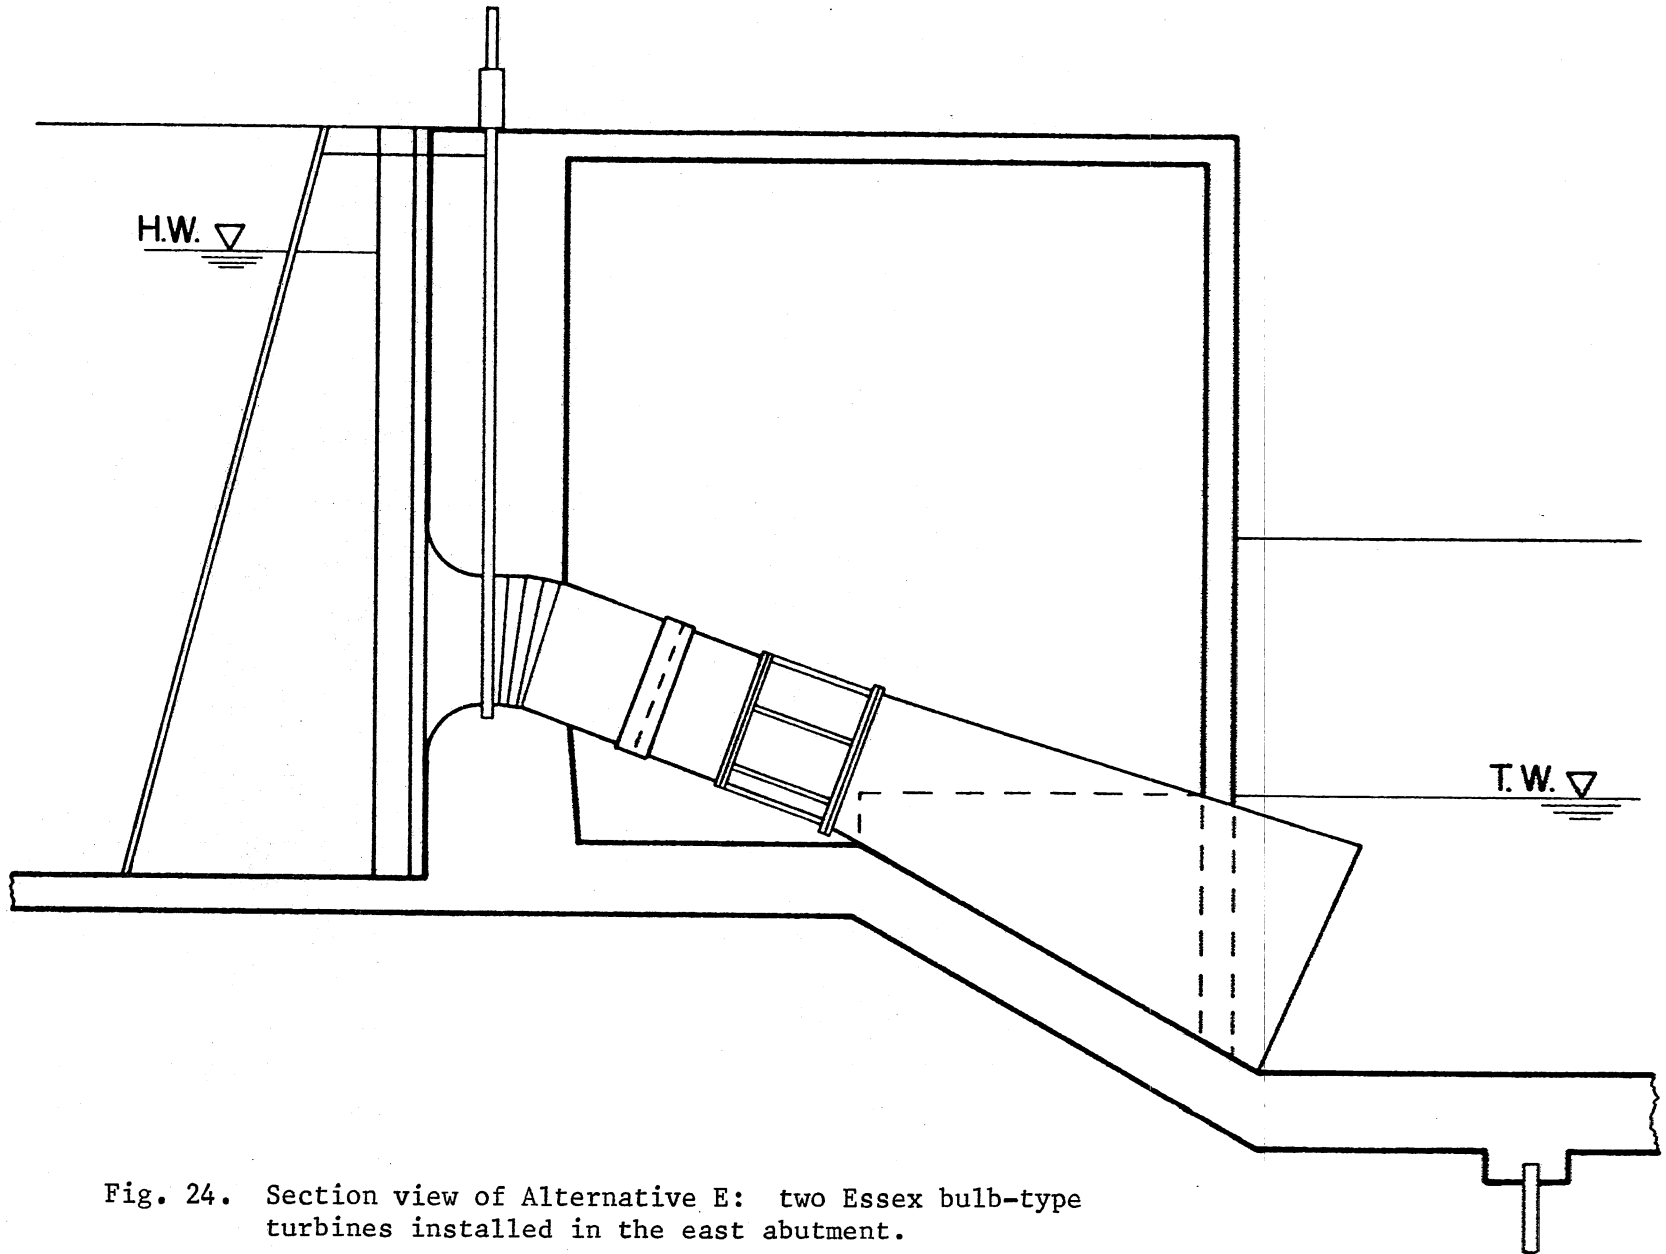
Section view of Alternative E: two Essex bulb-type turbines installed in the east abutment.
